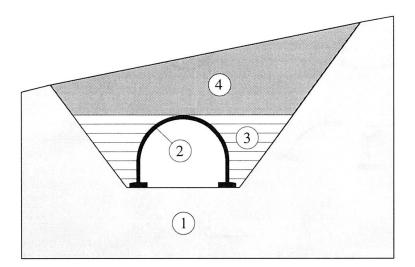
The structural system for a cut-and-cover tunnel① the original ground② the tunnel arch③ the lateral backfill④ the backfill above the tunnel roof
